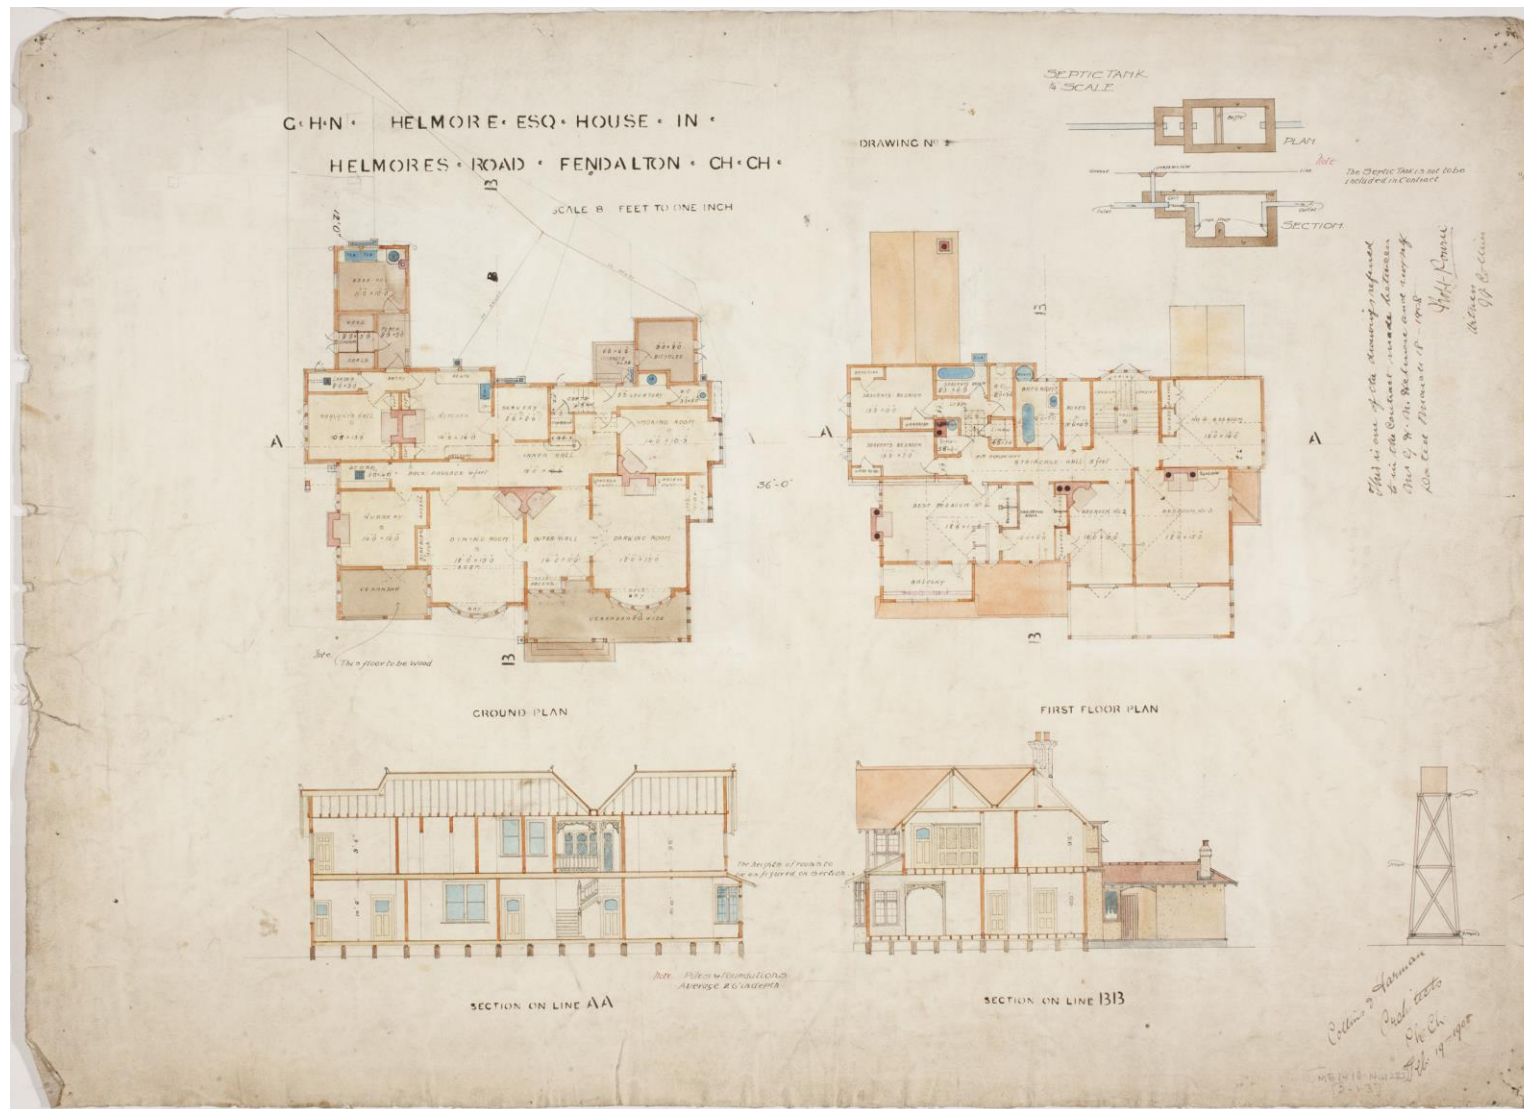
Collins and Harman, G. H. N. Helmore, House in Helmore's Road, Fendalton, Ch-ch., plans, sections and details (1908).
